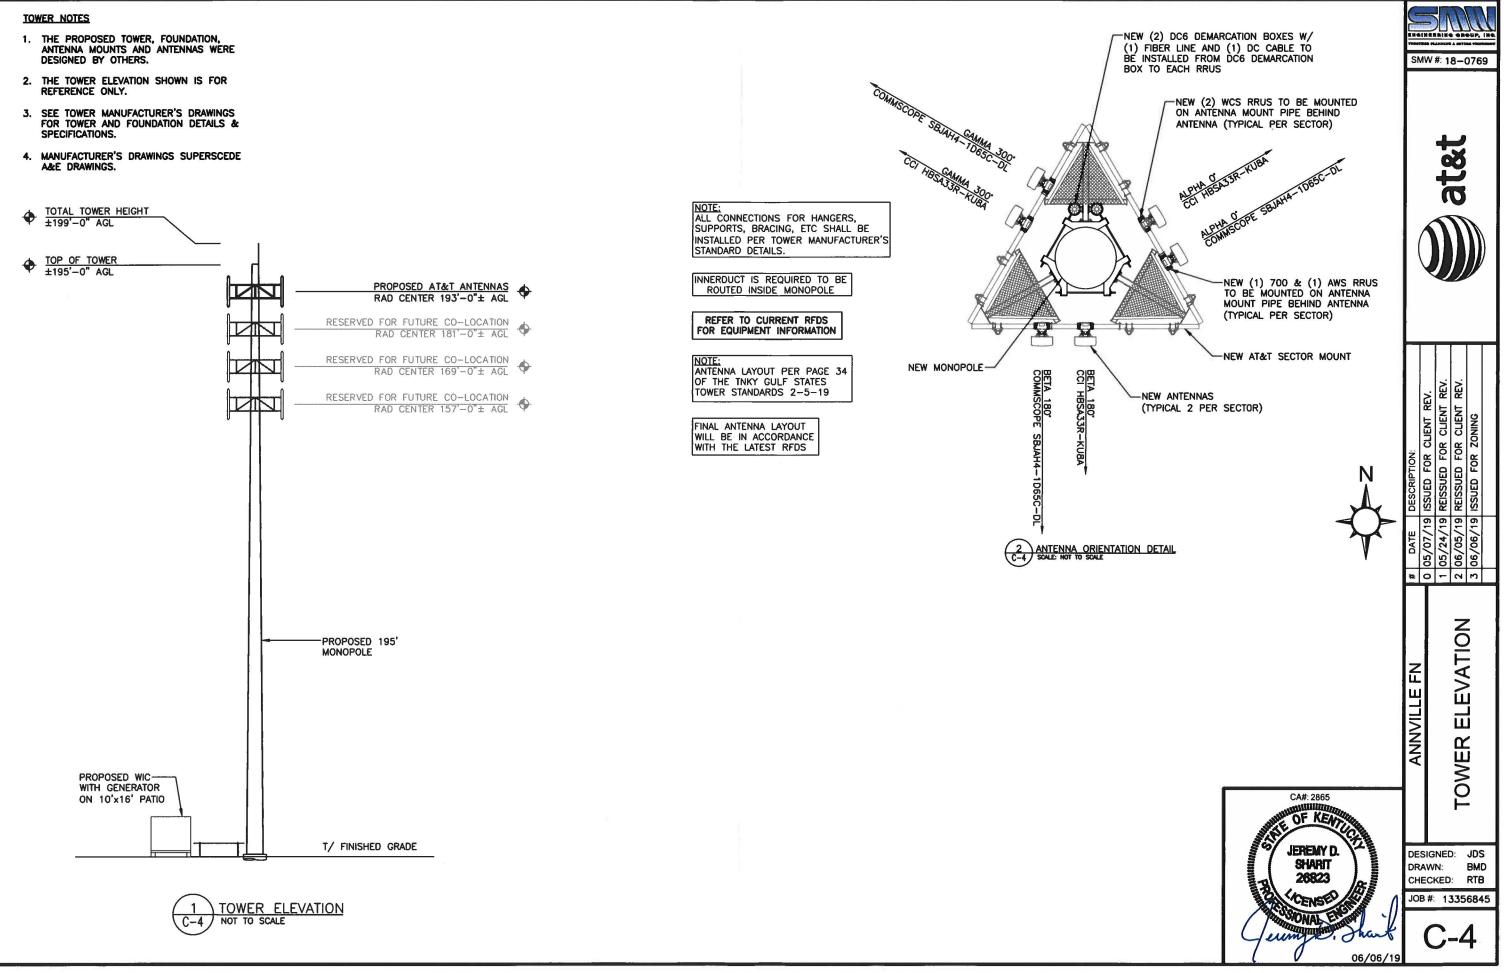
# EXHIBIT C TOWER AND FOUNDATION DESIGN
